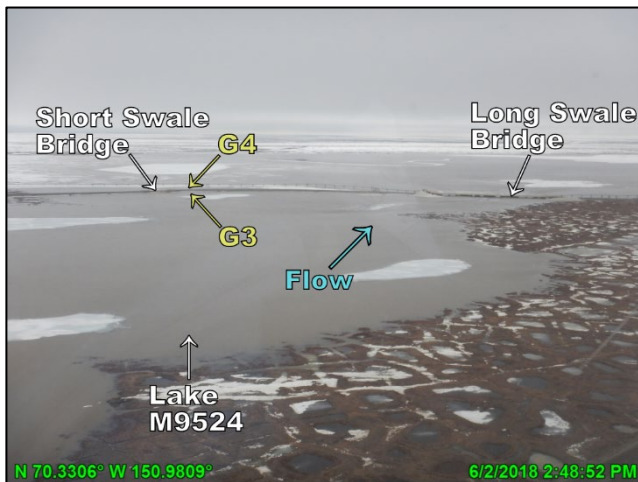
CD2 road drainage structures the day of peak stage, looking north (downstream); June 2, 2018
